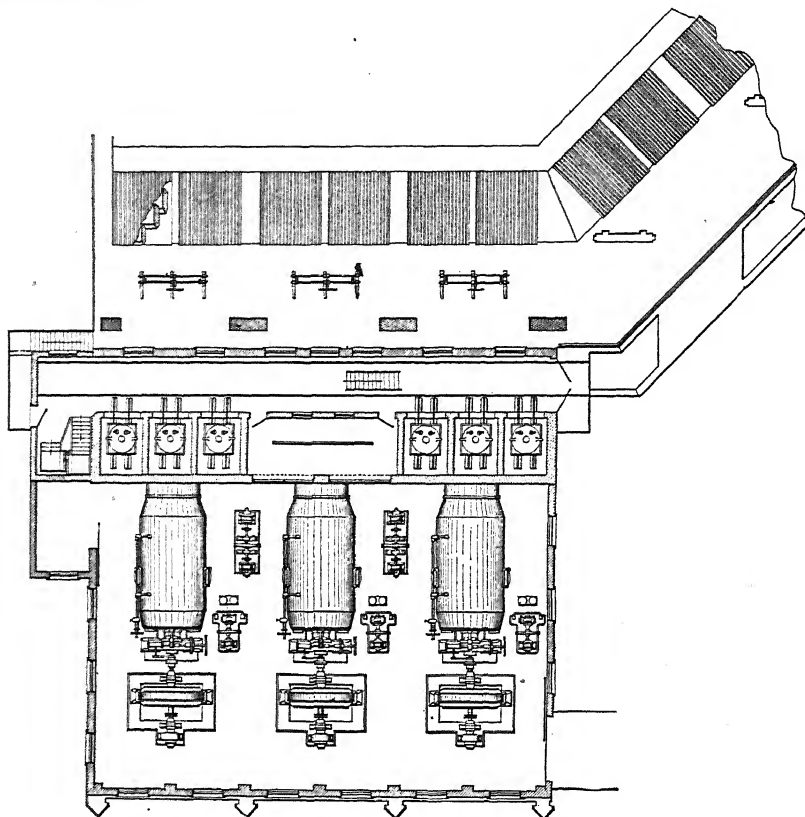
SECTIONAL PLAN, TWIN FALLS PLANT.
